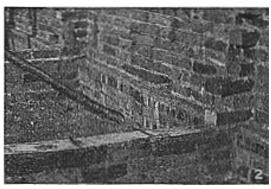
Sleeper walls, showing damp course slates, upon which floor plate and joists are laid.
